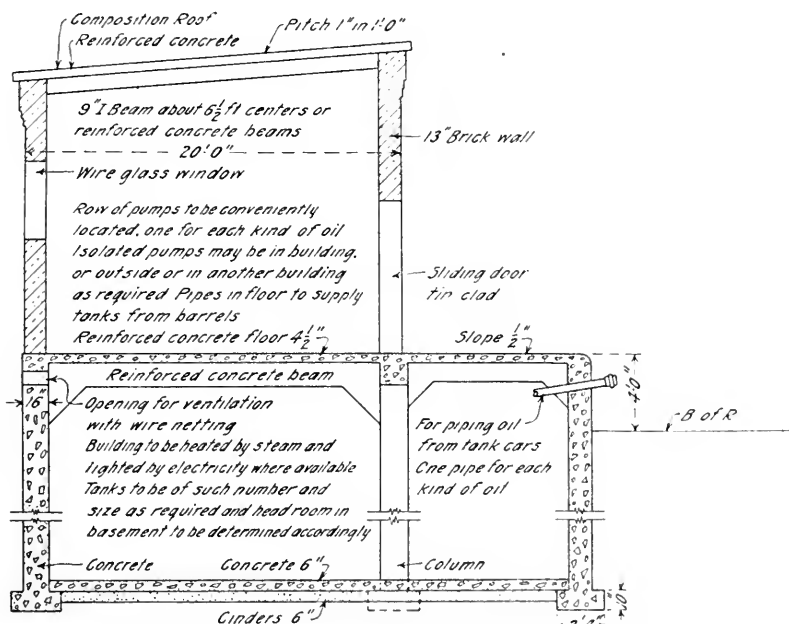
CROSS-SECTION OF TYPICAL OIL HOUSE, 20 BY 40 FEET.
